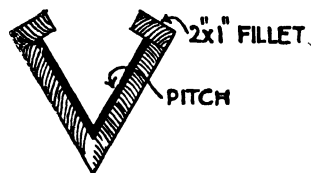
V-Shaped Wood Drains as Used in Benches.
